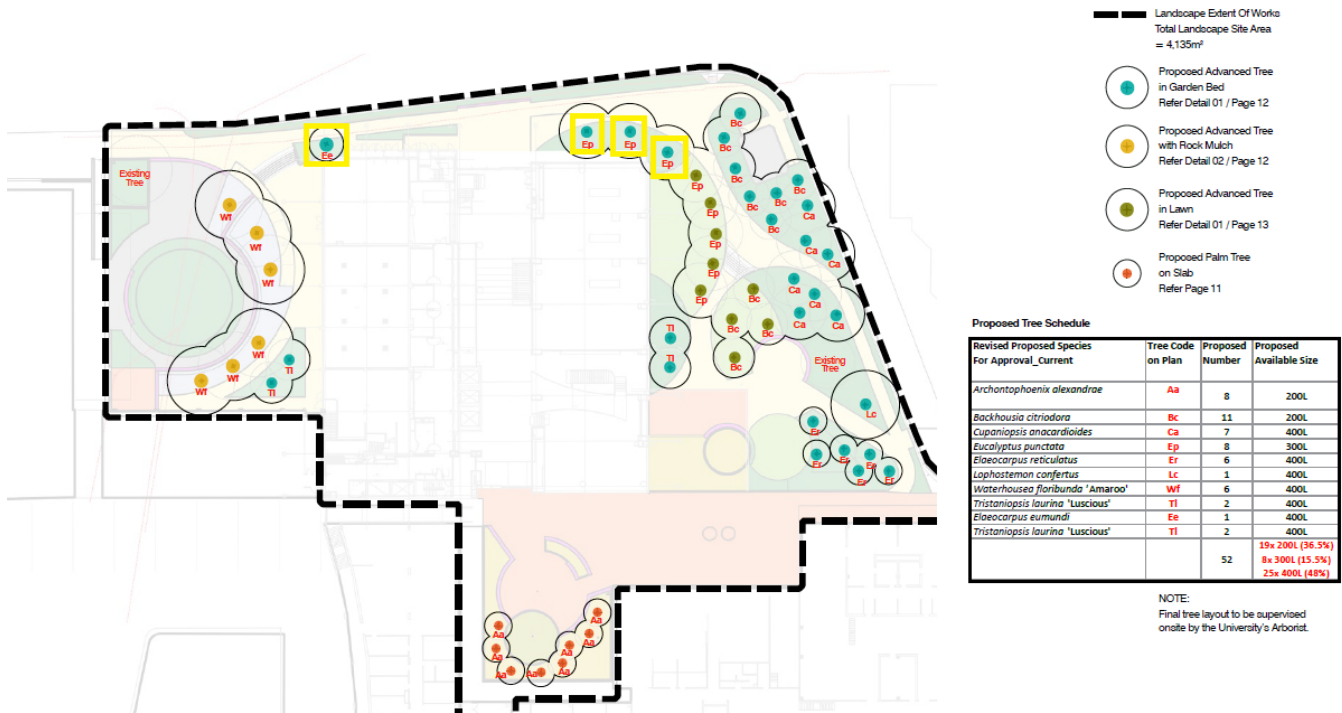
Updated proposed tree planting plan showing additional trees on Maze Crescent
